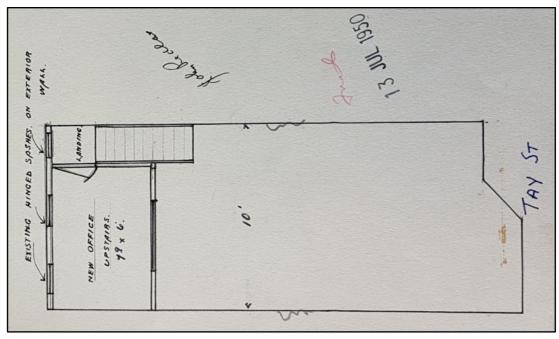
Detail from 1950 plan of Don Cameron's store at 30 Tay Street (Pealae, 1950).
